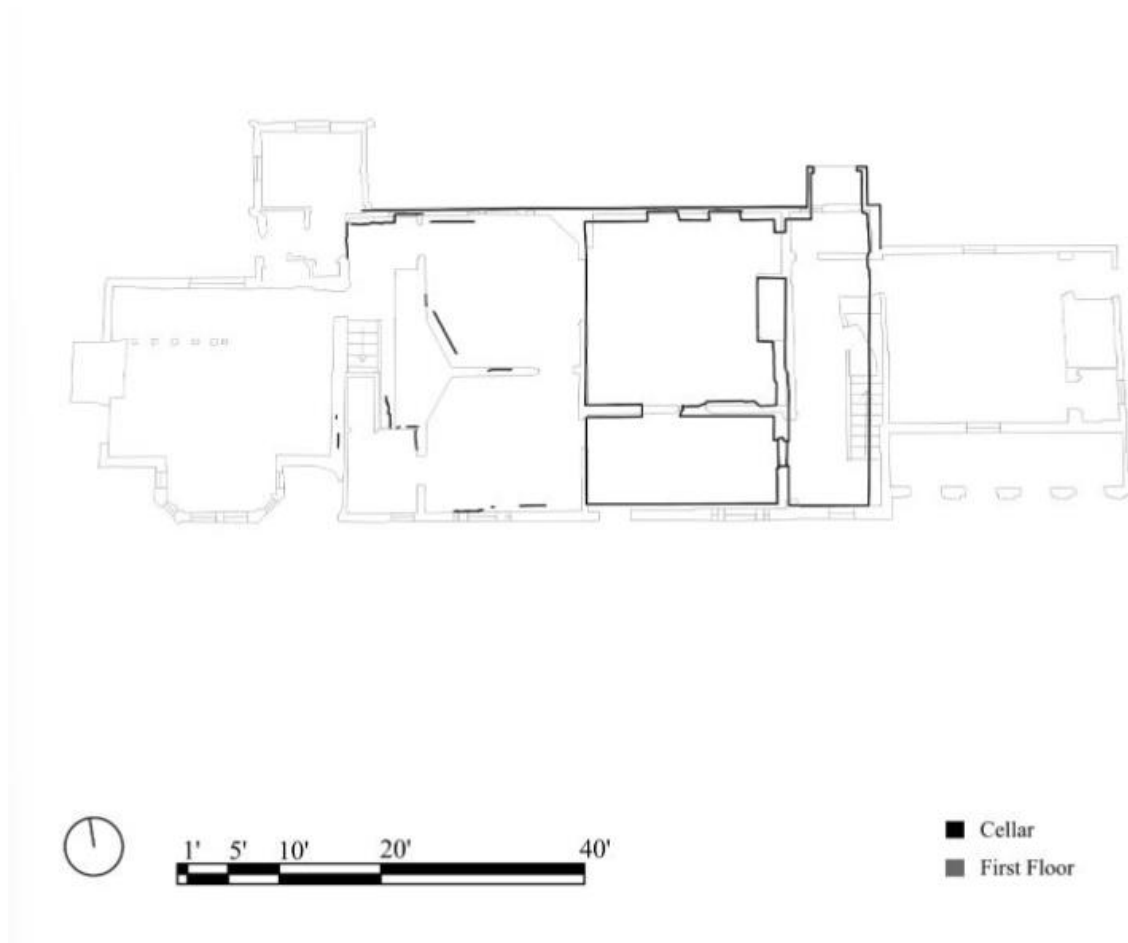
The cellar floor plan (in black) overlaid over the first-floor plan.
